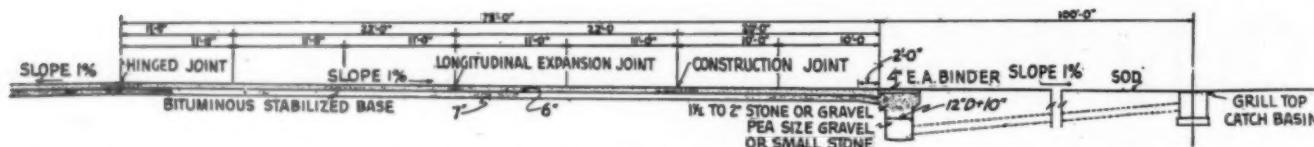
Typical Cross-Section of Half Section of Runways. The Cross-Section of the Loading Area, Apron, and Taxi Ramps Are the Same Except for Width
